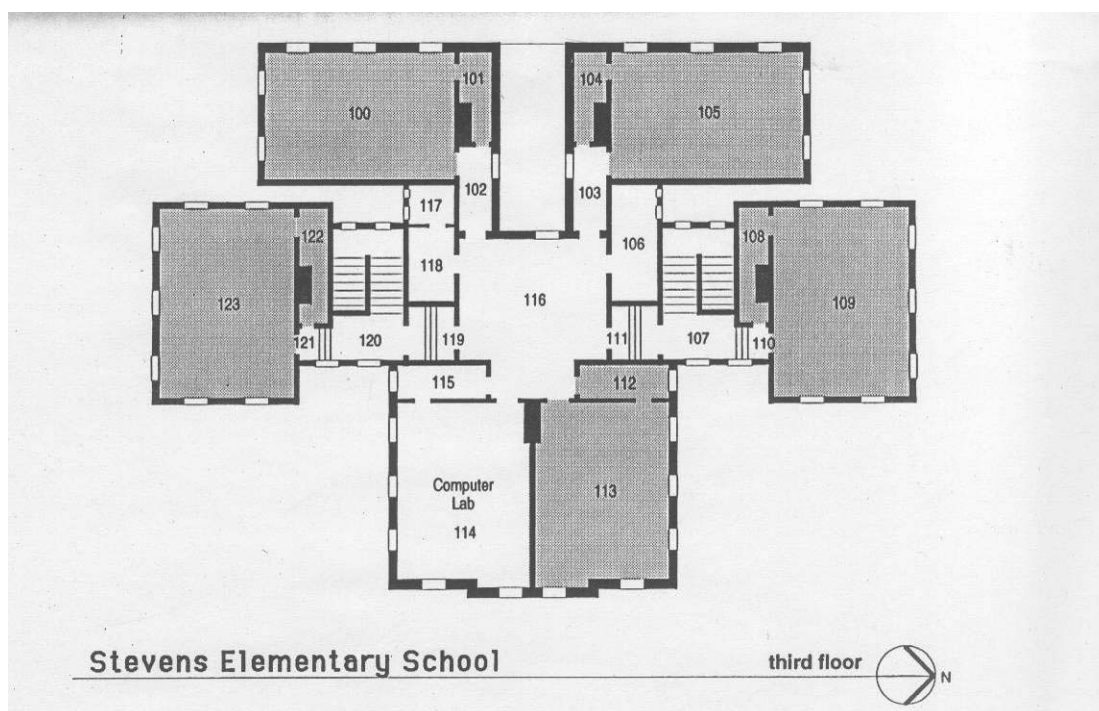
Stevens Elementary School existing third floor plan²⁶
